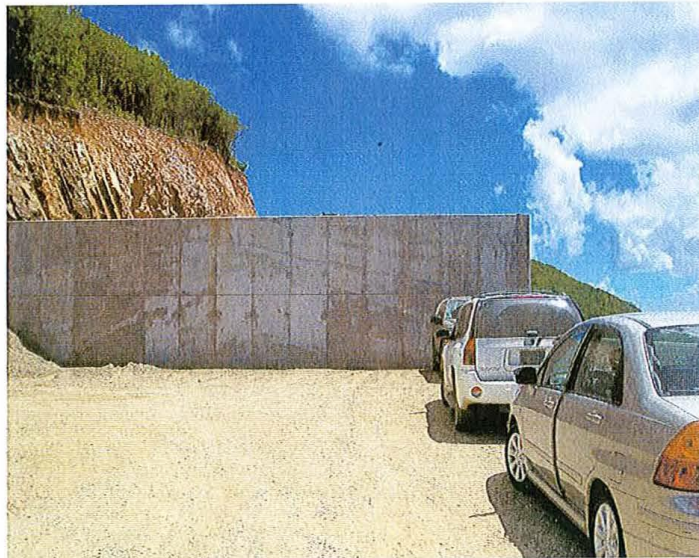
Another Identifiable Rock Slabs in the Excavation Face Further South of the Collapsed Area, Looking Toward North.
